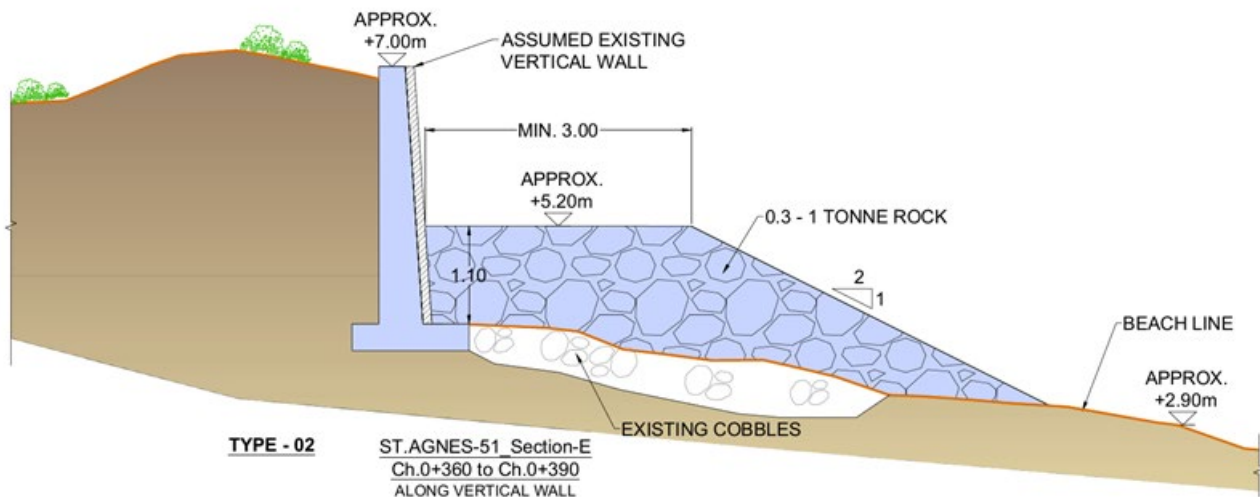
Typical cross-section along the east side of the vertical wall (Chainage 390 m to 360 m)
